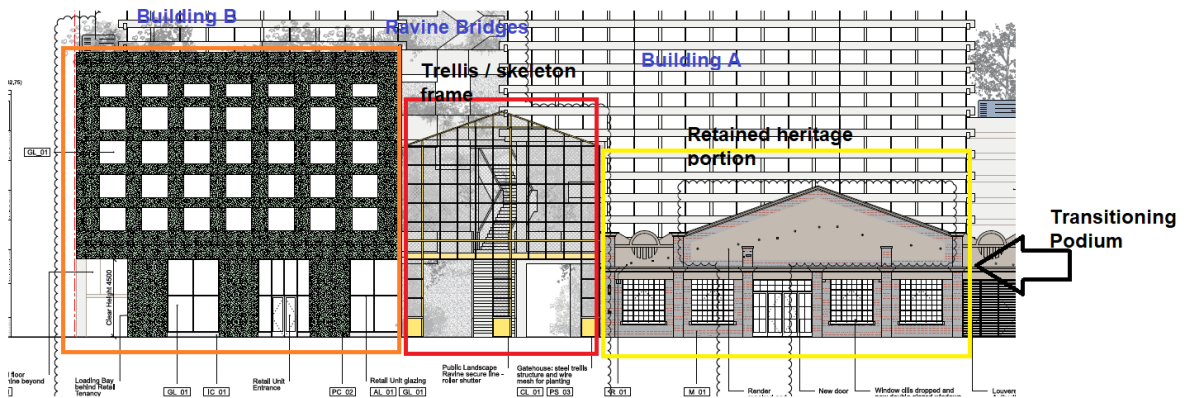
East elevation as prepared by 6a Architects, dated 22 May 2020 – with transitioning podium highlighted and varied frontage at the ground floor of Building B as result of the relocation of “Unit A”.
